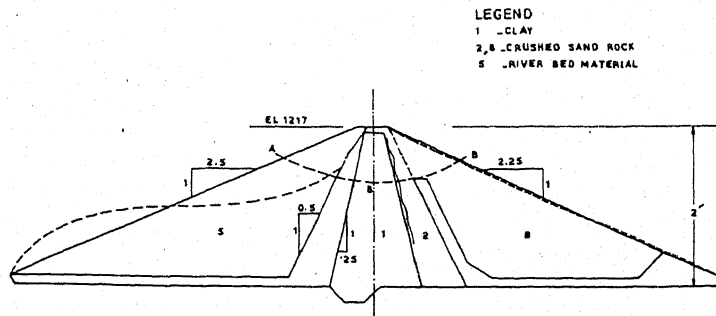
CENTRAL CORE SECTION RESERVOIR FULL TESTED TO FAILURE
